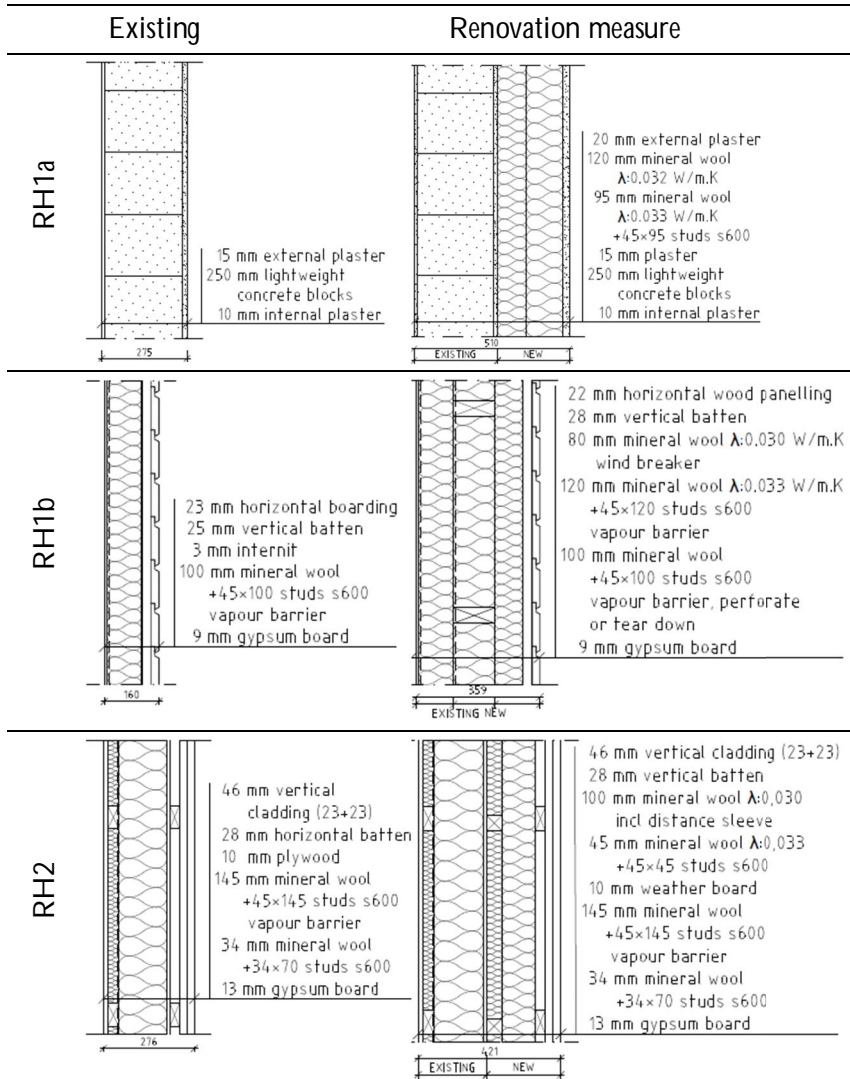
Vertical drawing of external wall for RH1a, RH1b and RH2, existing and renovation measure.
